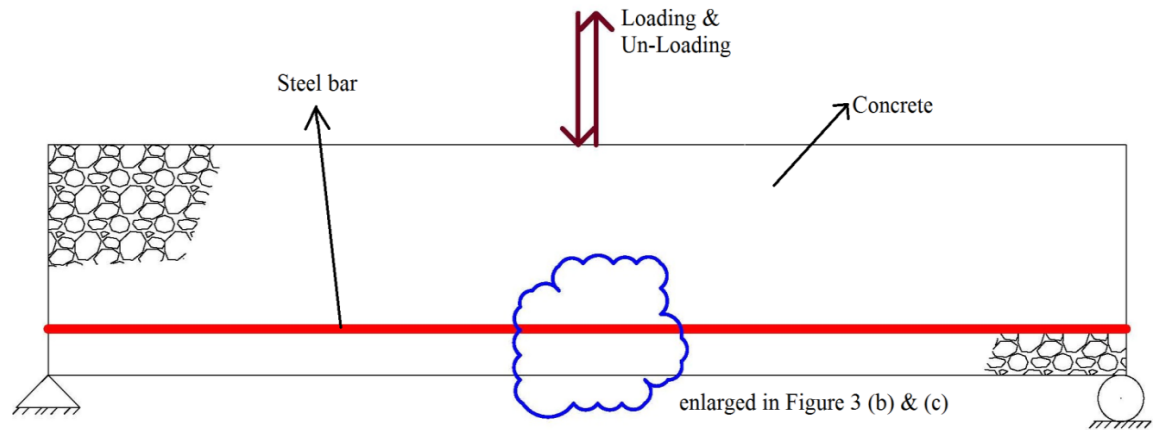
Longitudinal section in a simply supported RC beam under loading and unloading
